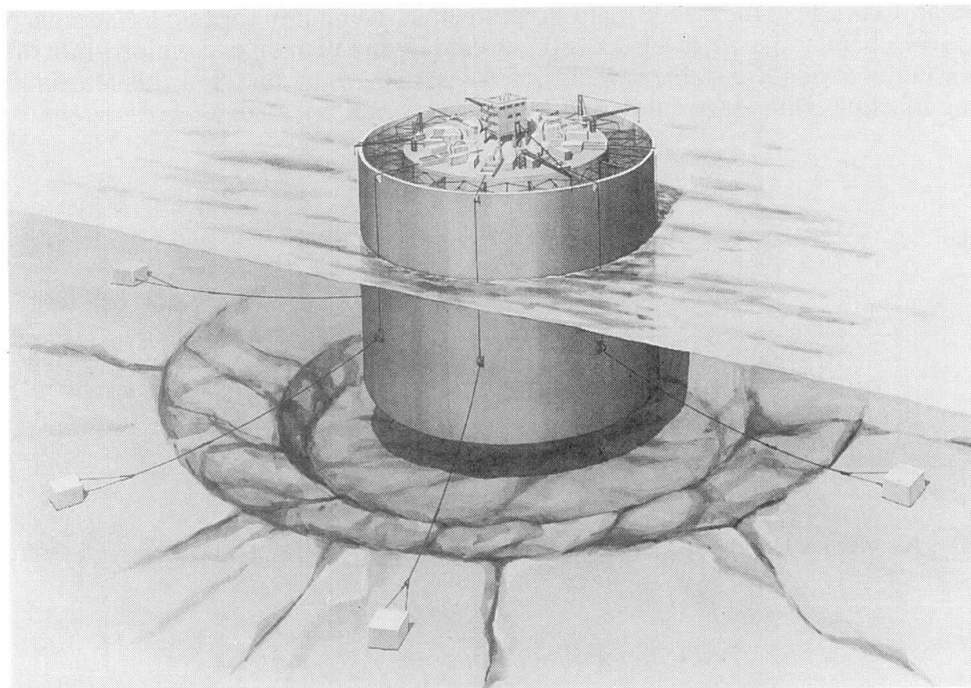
Installation of Prefabricated Steel Caisson on Excavated Seabed
